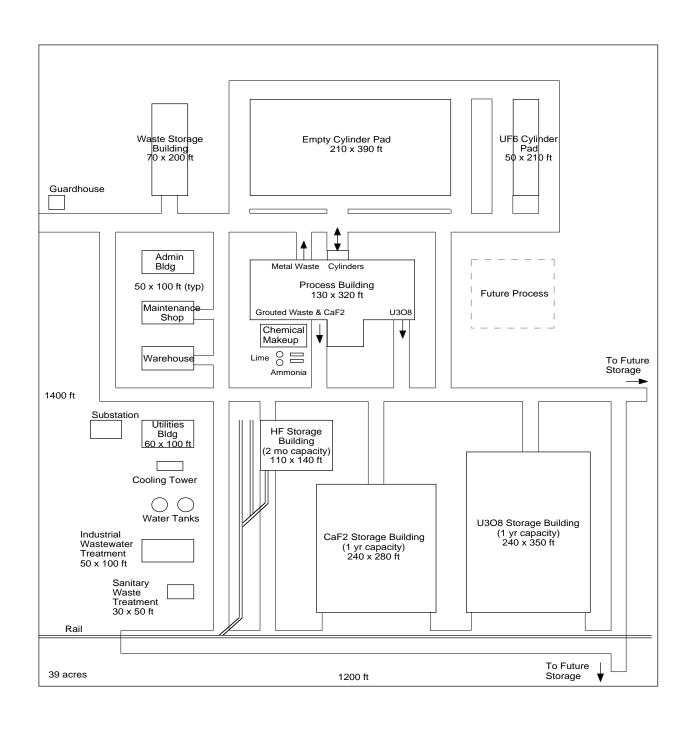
Facility Site Plan Conversion to U3O8, AHF and CaF2
